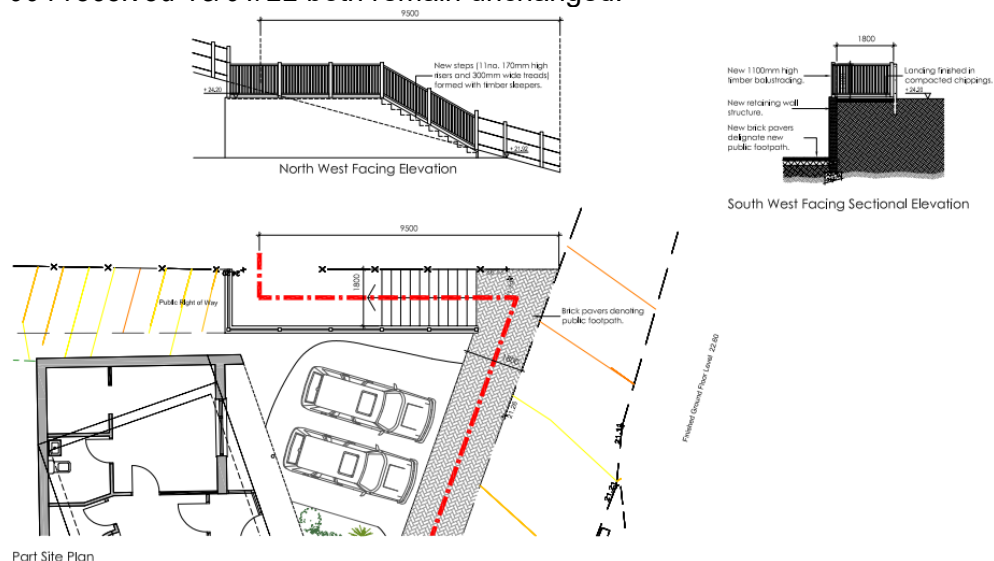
P1223-001/FP Rev A – Proposed Part Plan and Elevation
